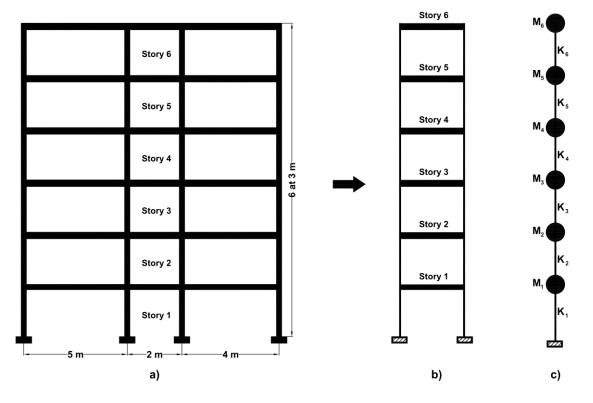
a) Full-scale 6-story shear building, b) Simulated 6-story shear building, c) Discrete system of shear building frame
